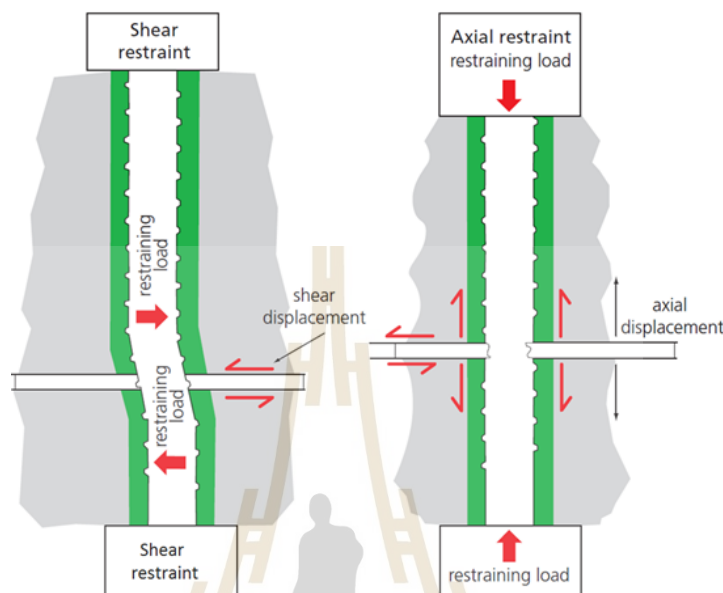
Rock bolt installed in rock joint (Minova, 2006).
